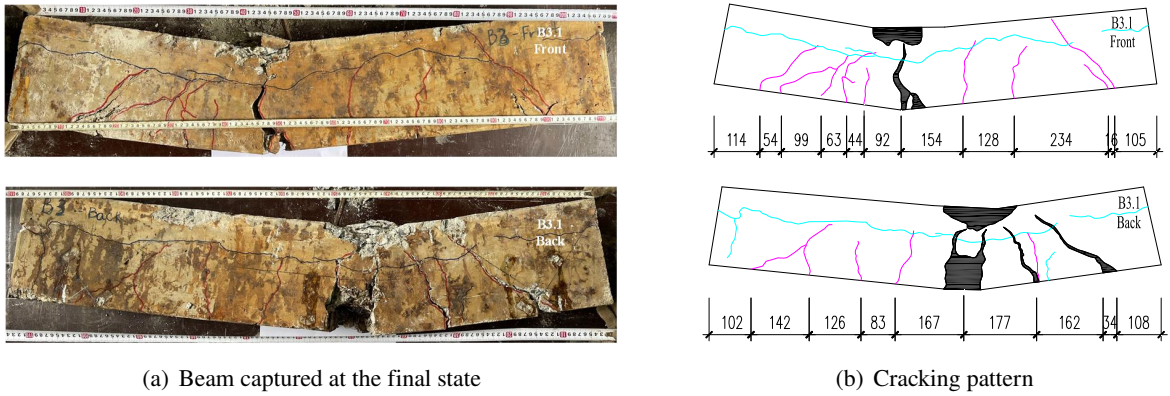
Failure mode and cracking pattern of the corroded beam B3.1-C
